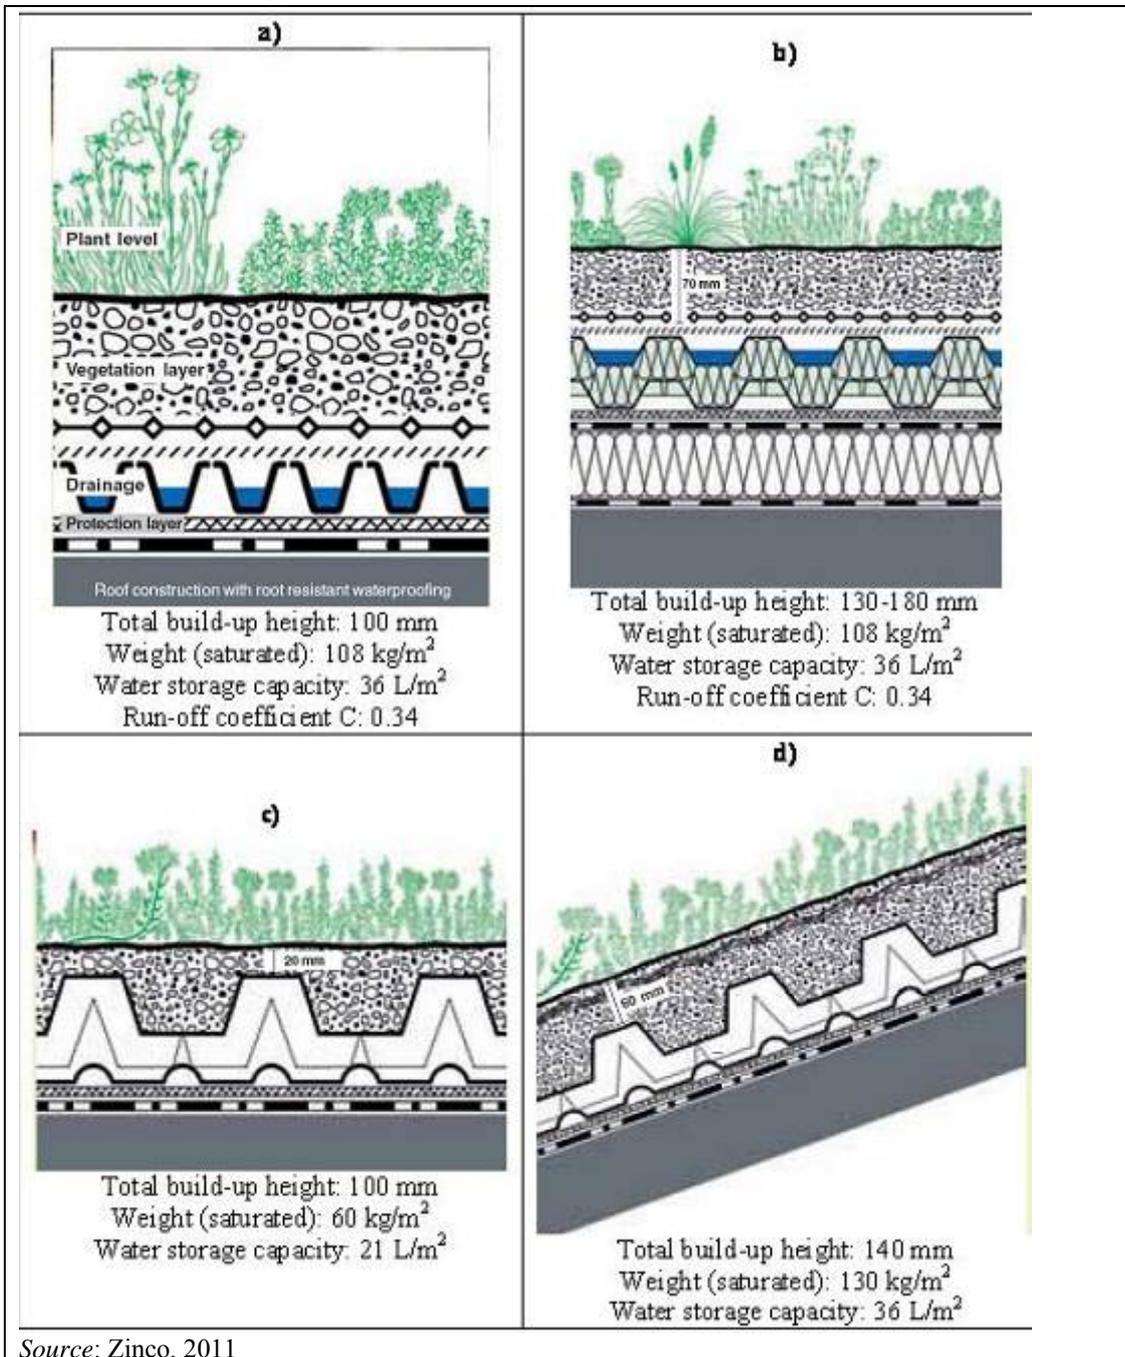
Green roof designs for: a) normal extensive, rock type plants, b) combined with thermal insulation, c) low weight option and d) pitched roof
